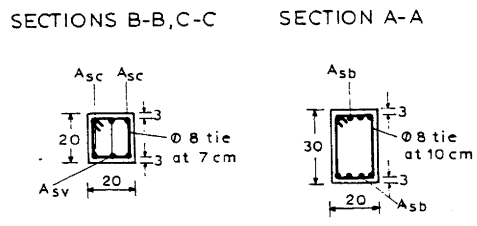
Dimensions and cross-sectional details of original specimens A_B, E_B, F₂ and L₁ (dimensions in cm).
